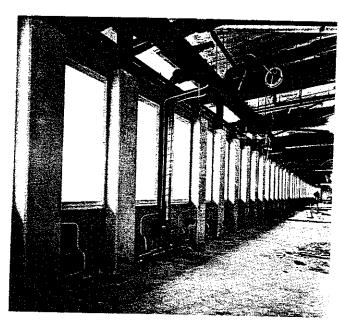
a. Facade columns with fire insulation in the form of prefabricated gypsum plaster sections
